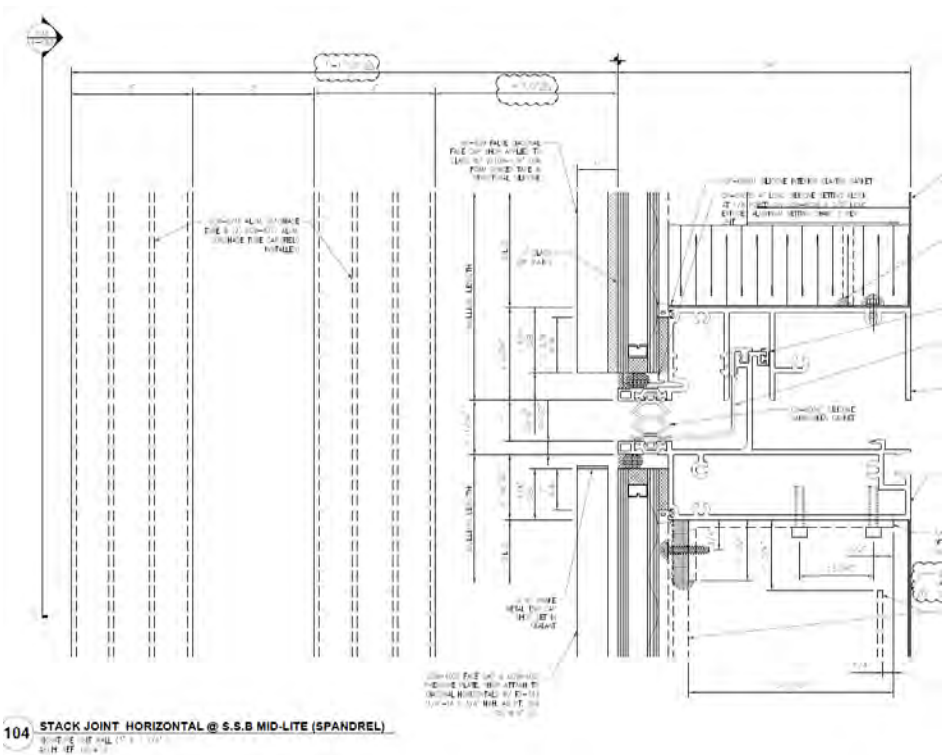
Detail #2. Section of the analyzed stack joint. Drawing 4-186.
